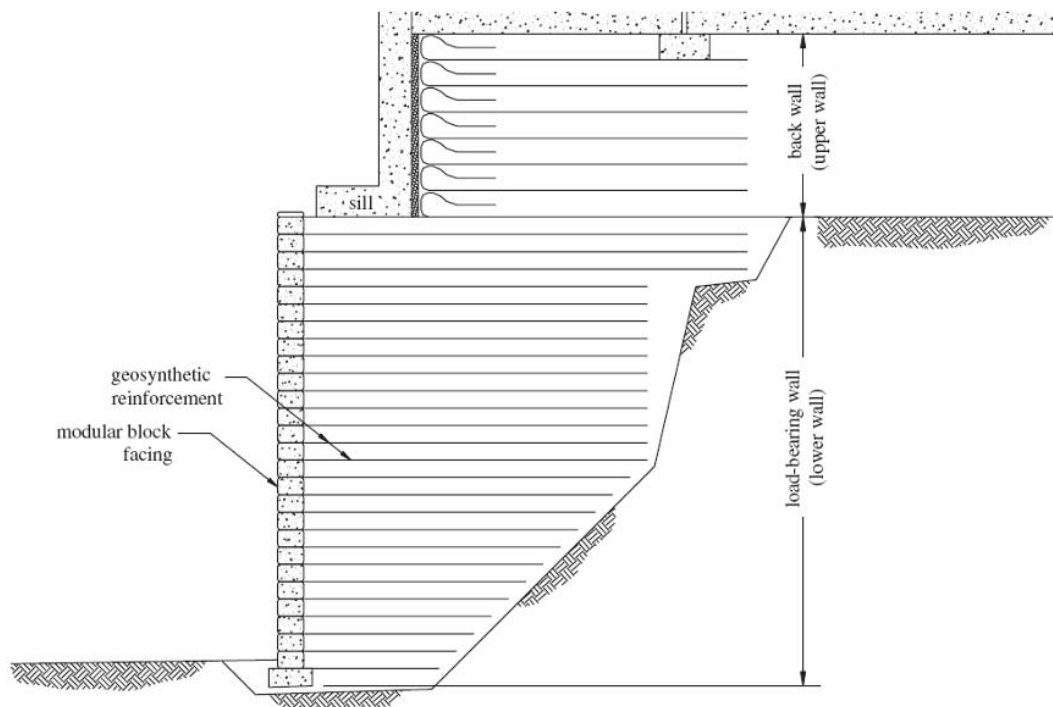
Typical GRS Bridge Abutment with a Segmental Concrete Block Facing
